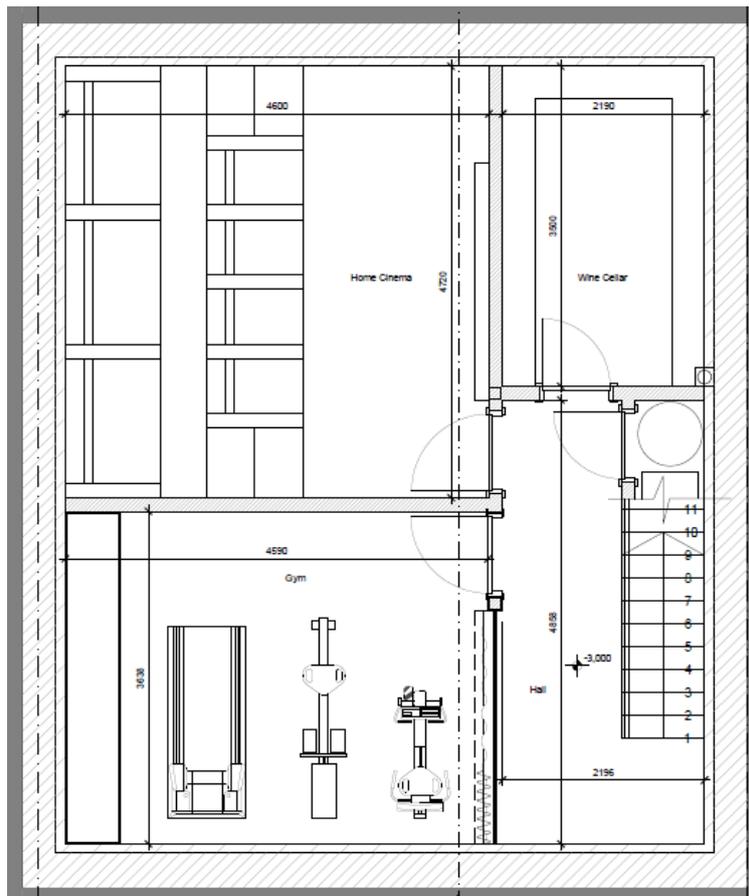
Proposed basement plan. The upper floors have been permitted under permission 2016/4582/P
